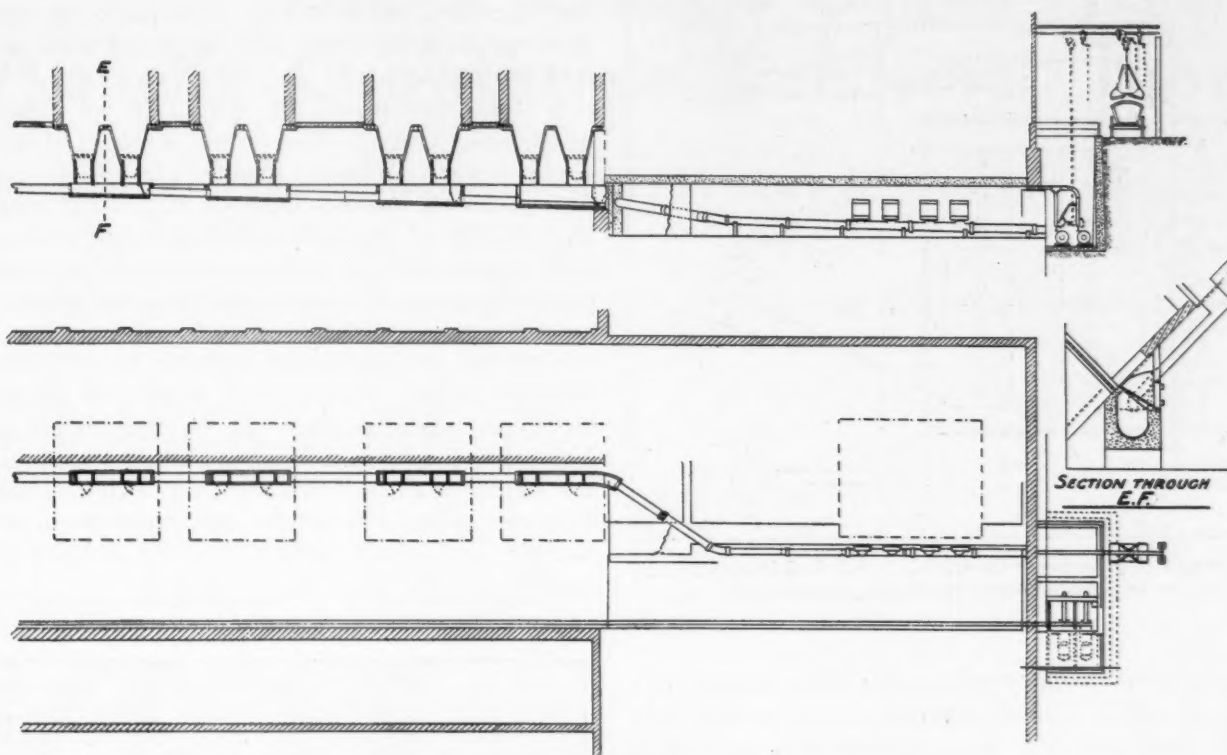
Typical sluice conveyor layout for four boilers. Ash is removed from sump by grab bucket and deposited in trucks
